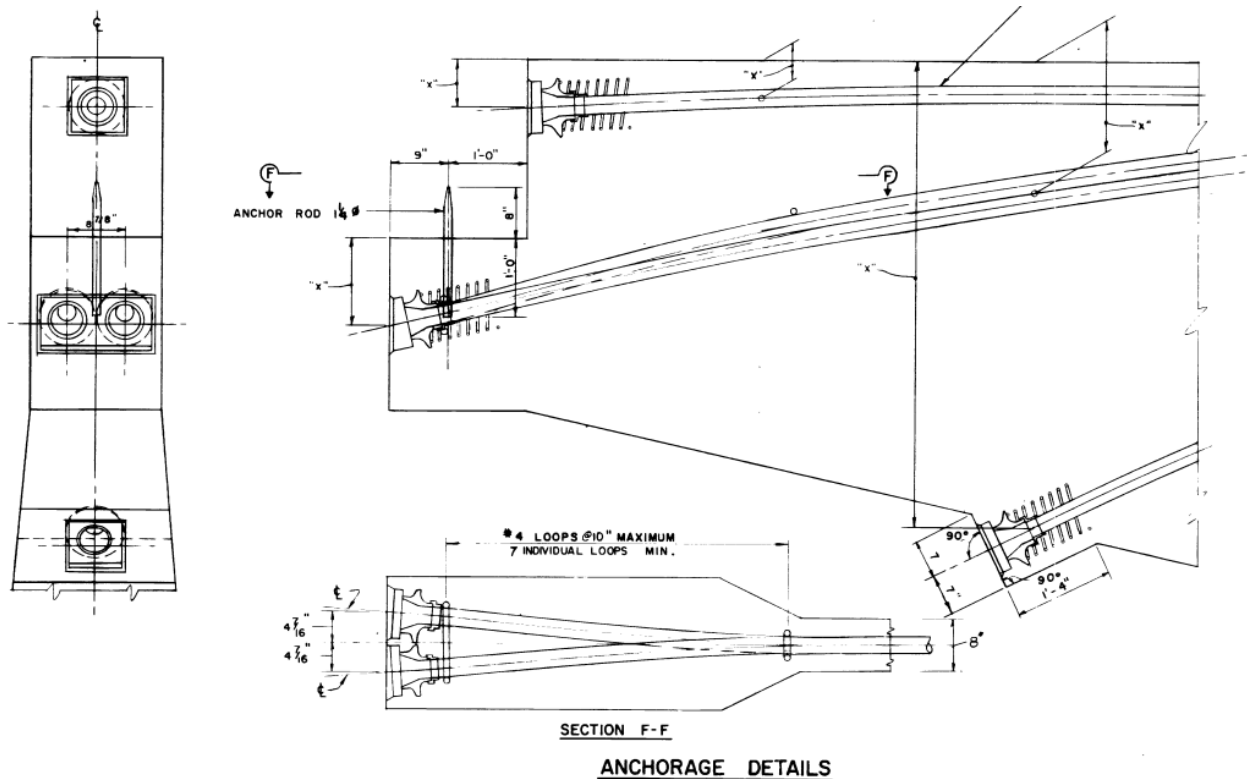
Post-tension anchorage details in cantilever beams (Sheet 78, Cantilevers Sheet 5 of original plans, 1967).
